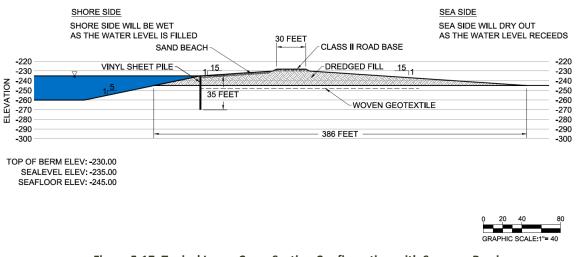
Typical Levee Cross-Section Configuration with Seepage Barrier
